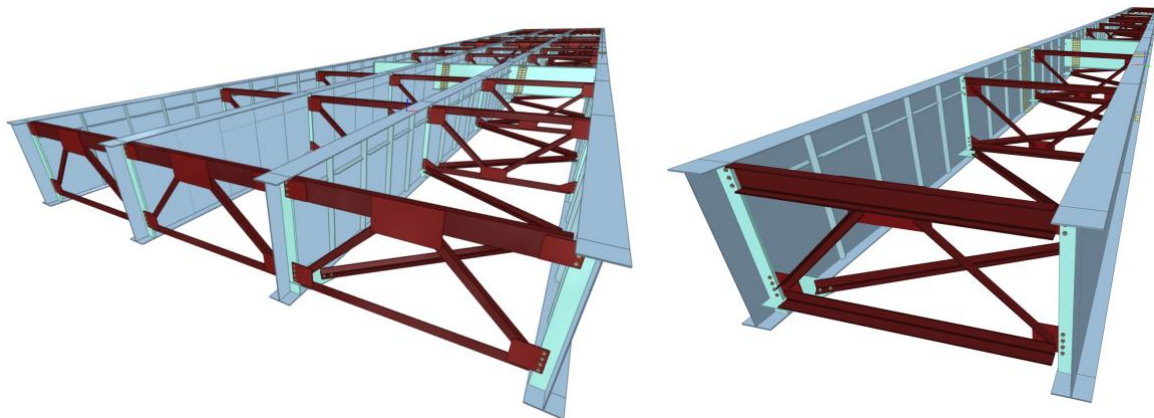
Aerial view and side view of steel plate girder bridge information model.
